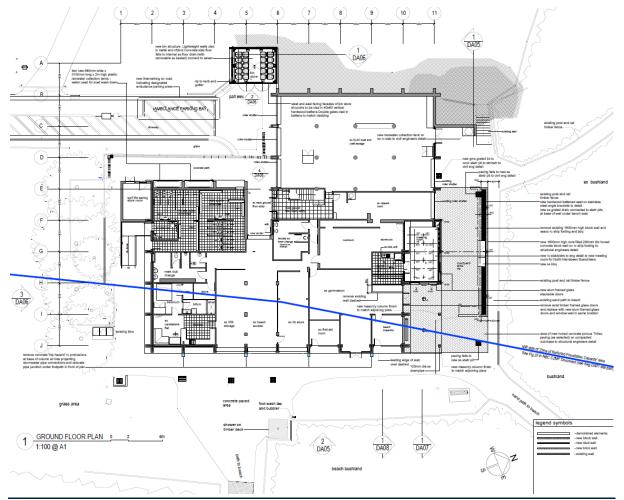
Ground Floor Plan for North Narrabeen SLSC Alterations and Additions (DA02-D)
